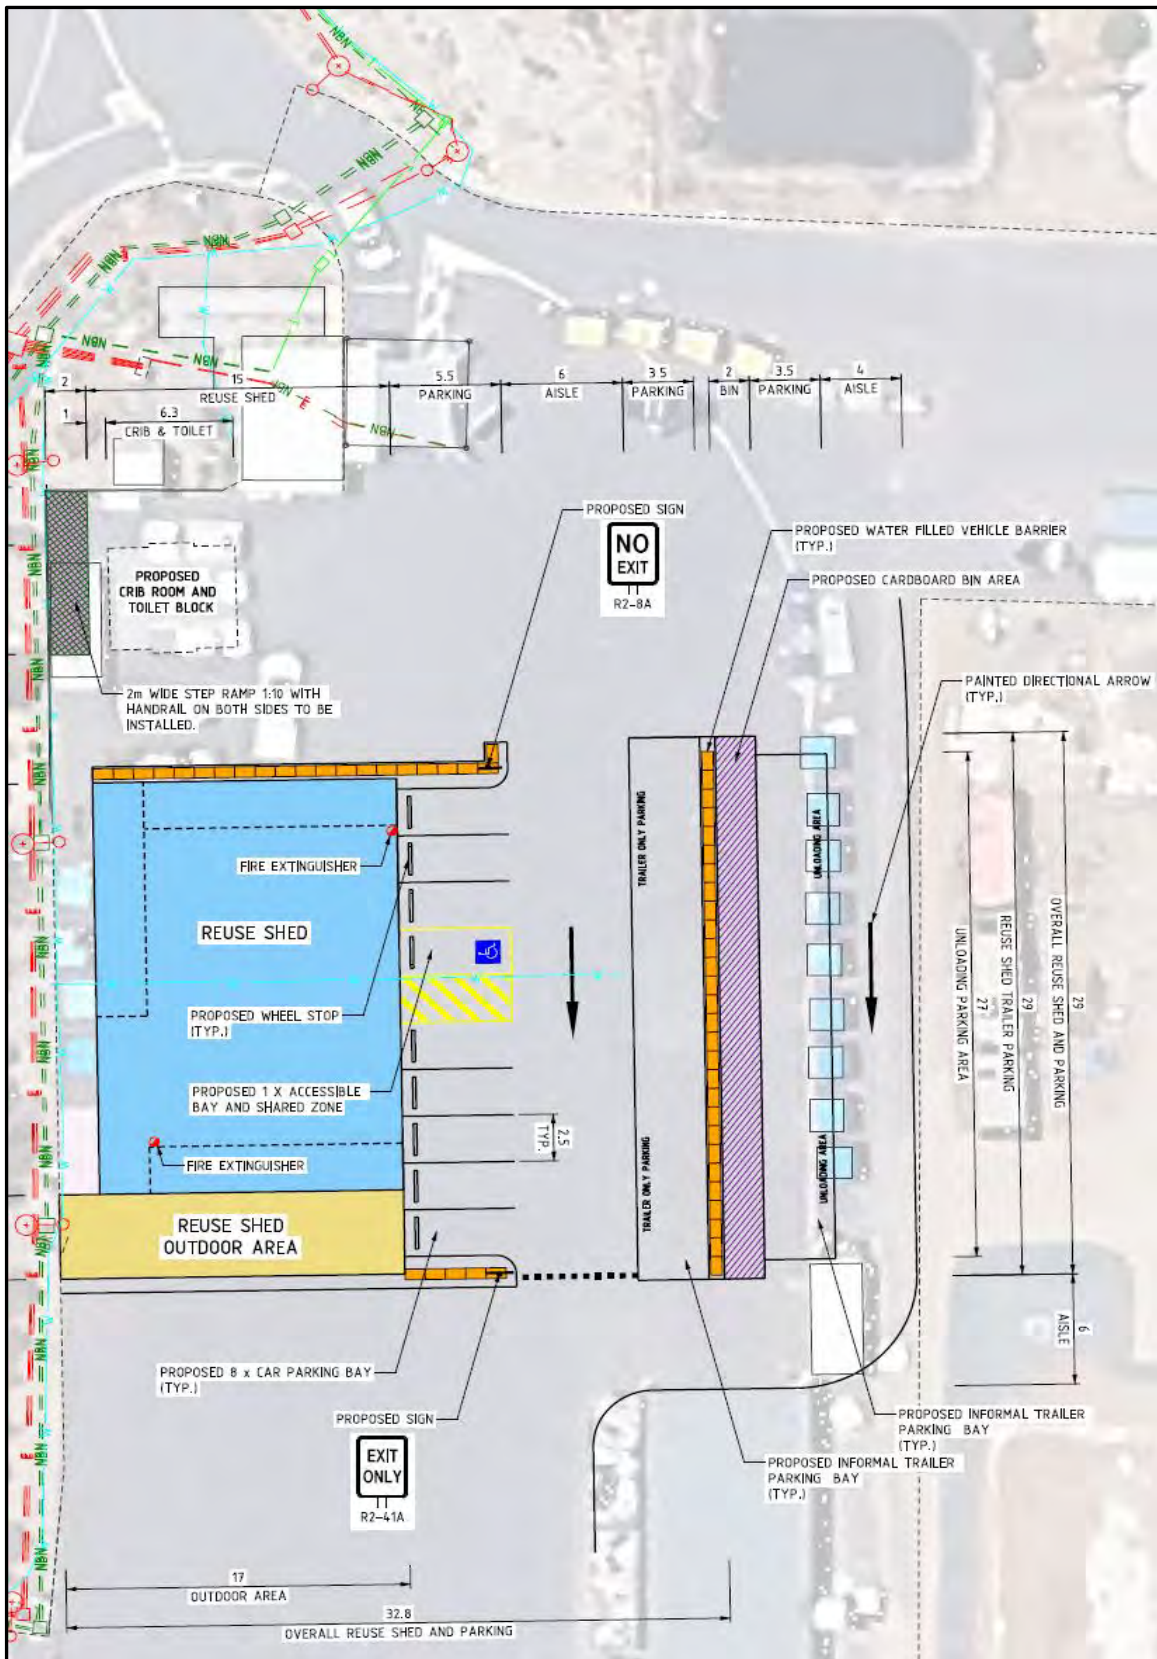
Proposed Reuse Shop location and layout, south of facility gatehouse at BTWRC.
